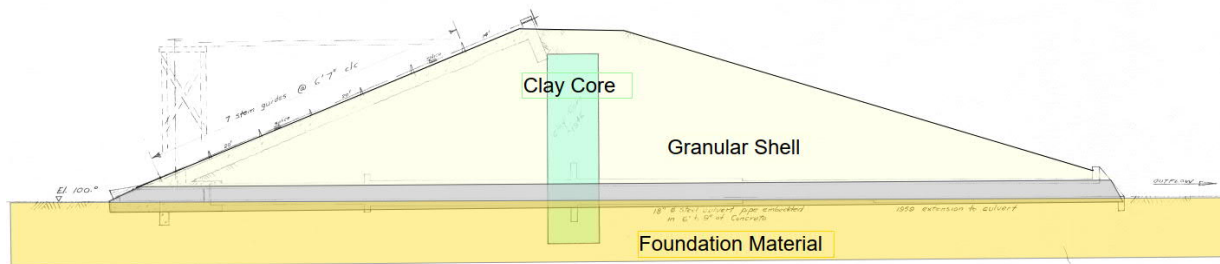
Typical Cross Section of the Elinor South Embankment Dam
